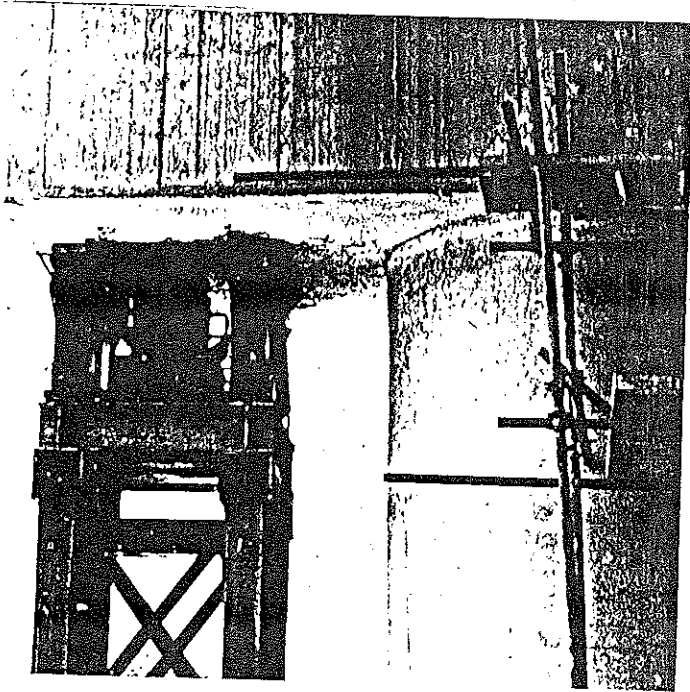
PIER CAP JACKED UP AND STEEL COLUMN PLACED UNDER THE CAP
